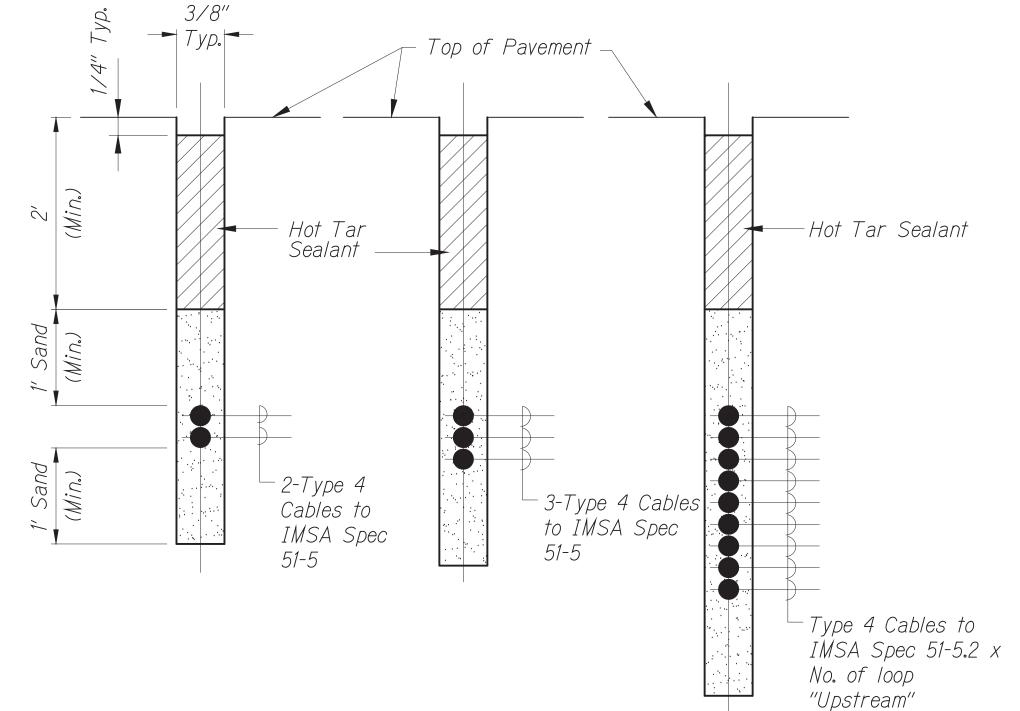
# DETAIL OF SENSOR LOOP INSTALLATION AT EDGE OF ROADWAY
